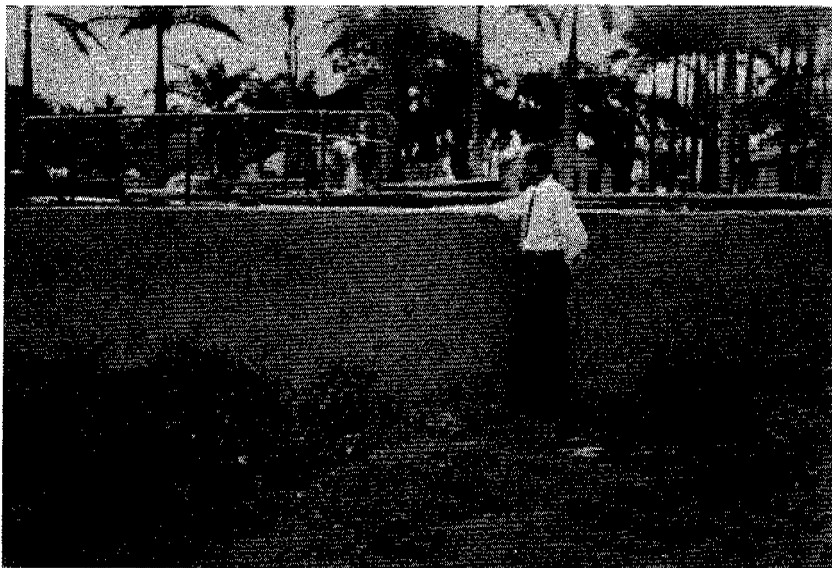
Top of wall of lock in South New River Canal at South Bay was once close to the ground surface; loss of the muck soil by oxidation and bacterial action in dry periods has caused surface to subside about 4.5 feet.
